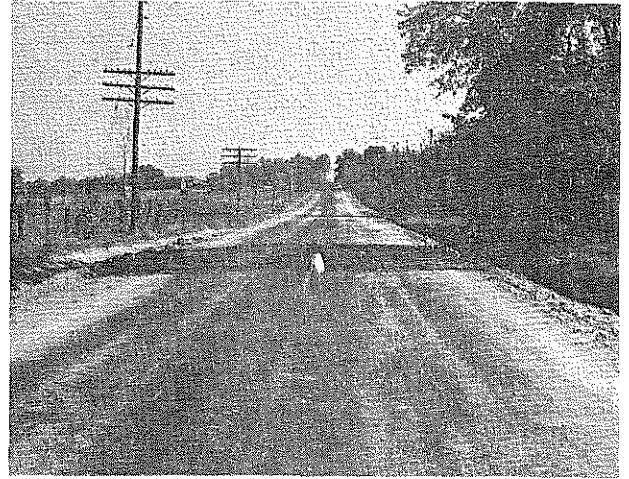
Finished surface, looking north from Station 47+00. Shoulder construction had not been completed.
